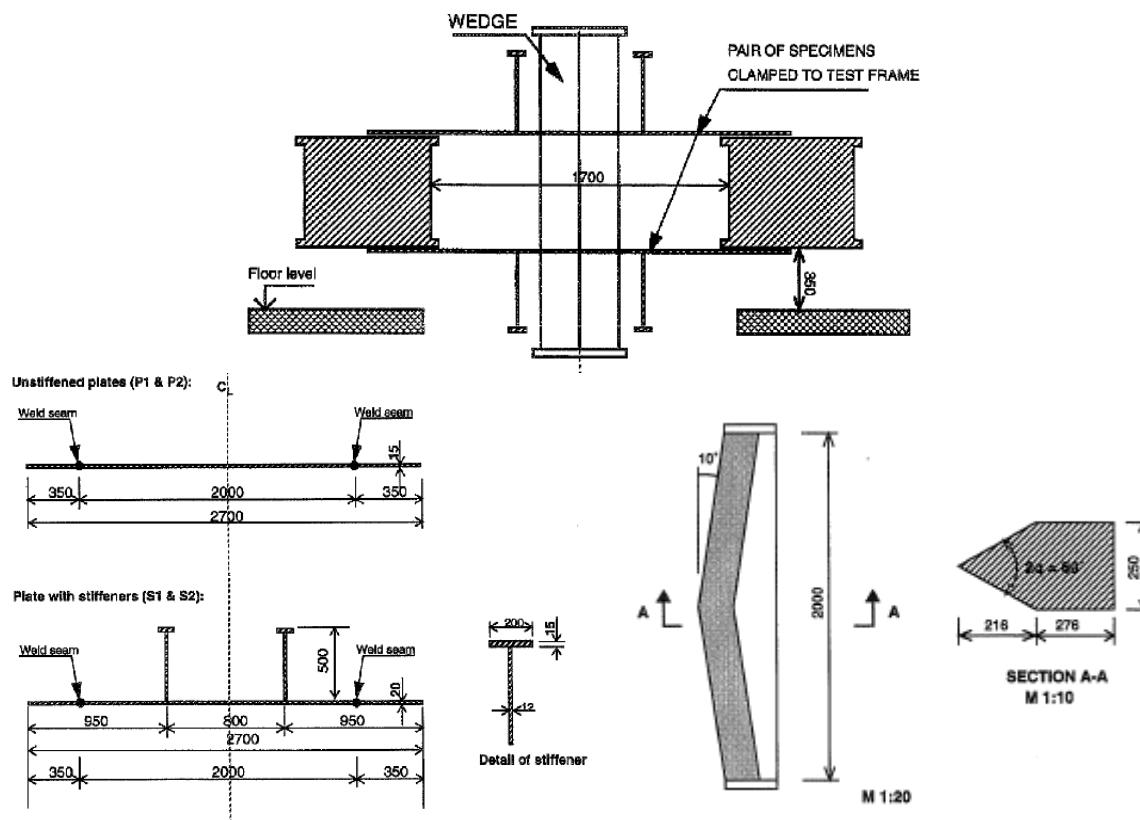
Experimental set-up (upper), specimen configuration (lower on the left) and schematic view of the wedge (lower on the right)
